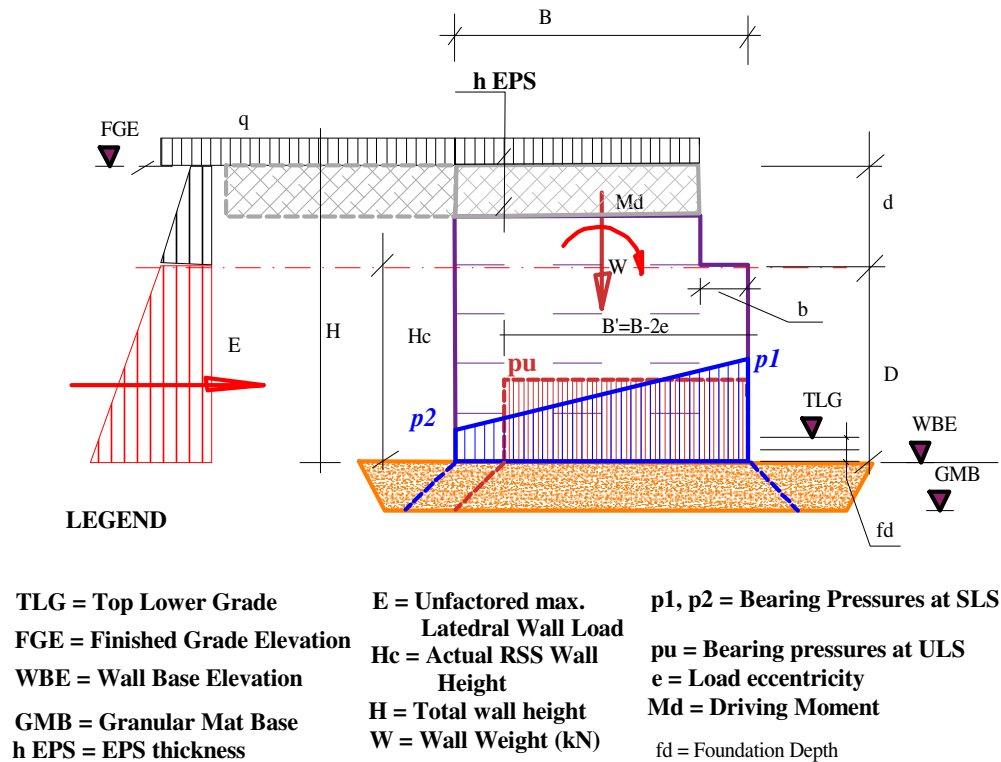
Schematic Arrangement of RGM with RSS Gravity Wall
